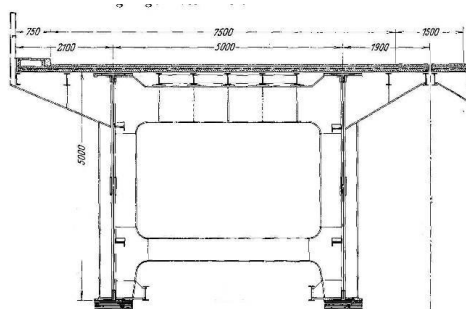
Steel upper flange of main beams with stiffened steel plate deck plate - proposal by W. Winkel, 1936
